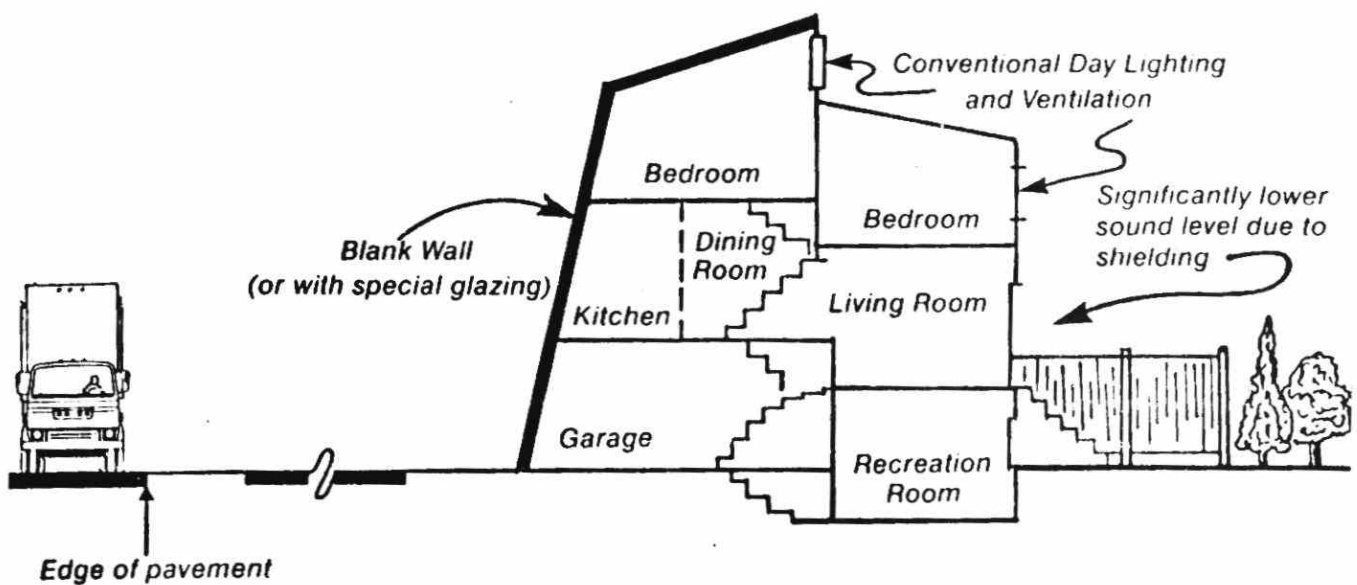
B.24.: The Use of Blank Walls for a Townhouse
